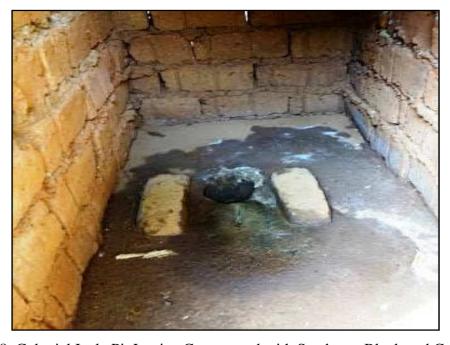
Colonial Igala Pit Latrine Constructed with Sandcrete Block and Concrete. Source: Field Survey (2017).
